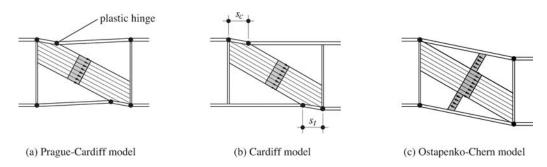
Failure mechanisms for a web panel in a plate girder.
